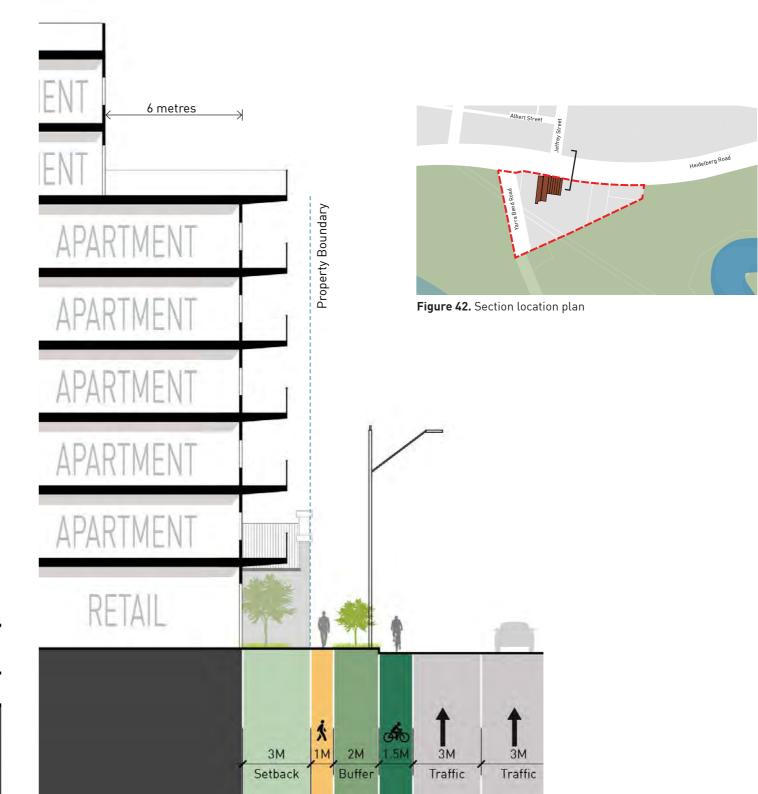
Proposed interface to Heidelberg Road - detailed street section
